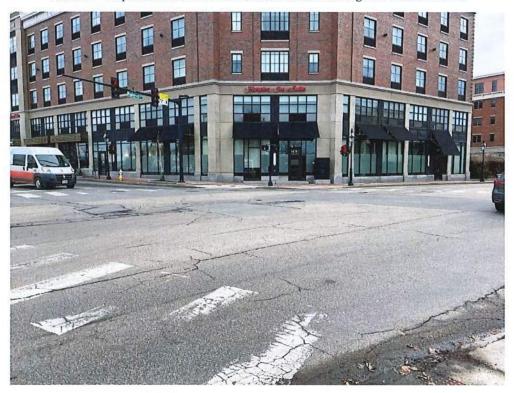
Maplewood Ave and Deer Street intersection looking east. Taken 1/19/23
